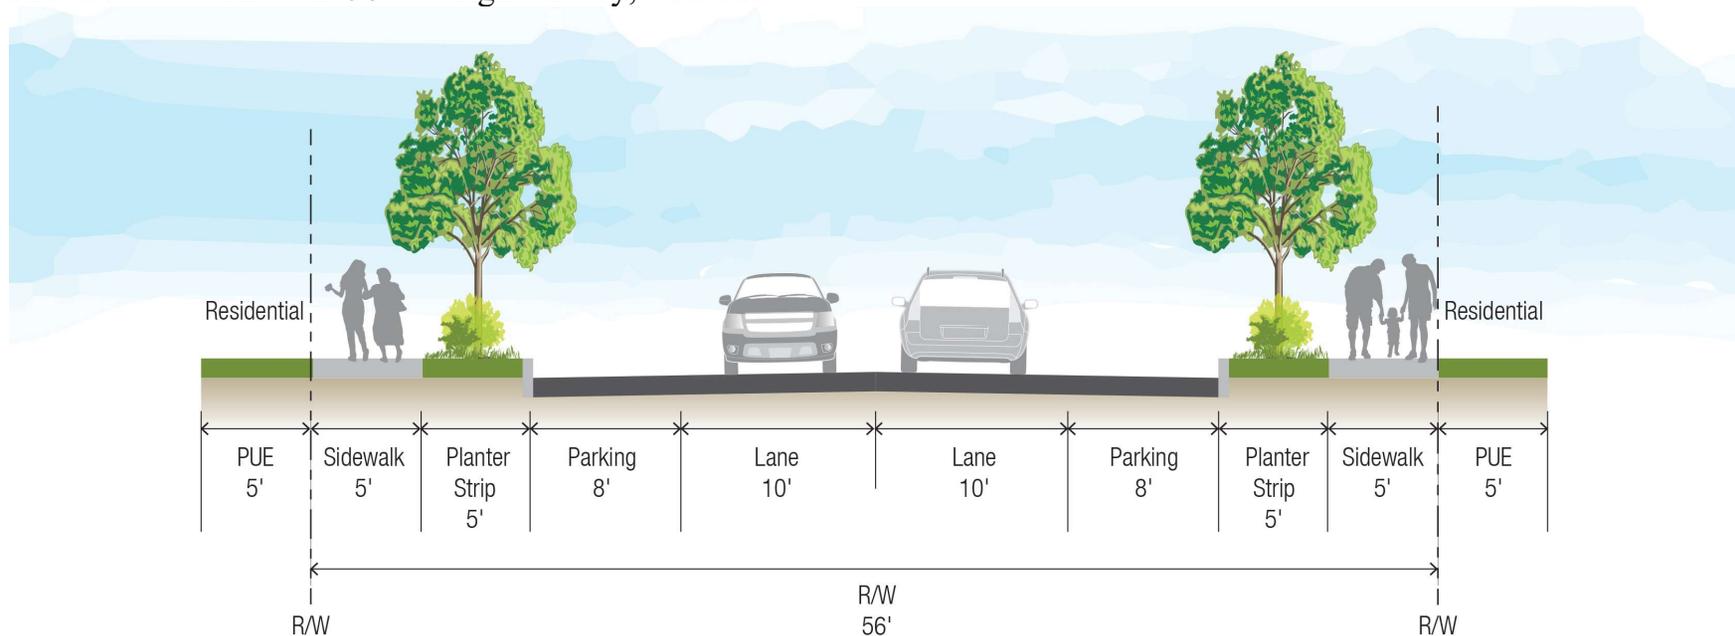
Typical Local Neighborhood Street Section (Residential Both Sides)
